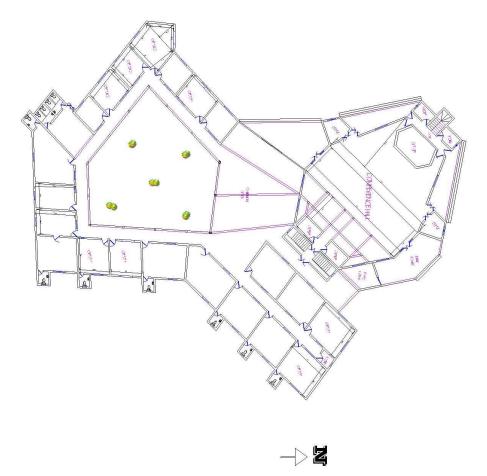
Floor plan of Women Development Centre, Yola and the observed spaces. (Source: Author's field work 2022).
